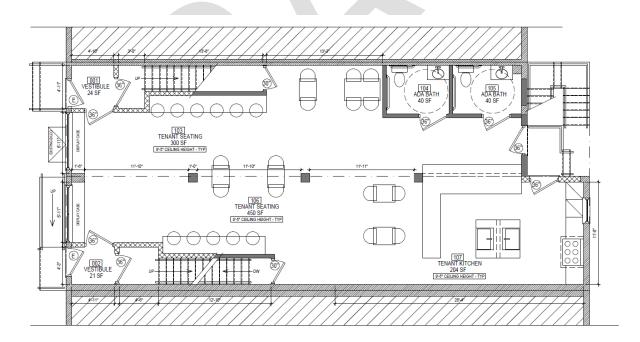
46-48 S. Carrollton Avenue - Proposed first floor plan
